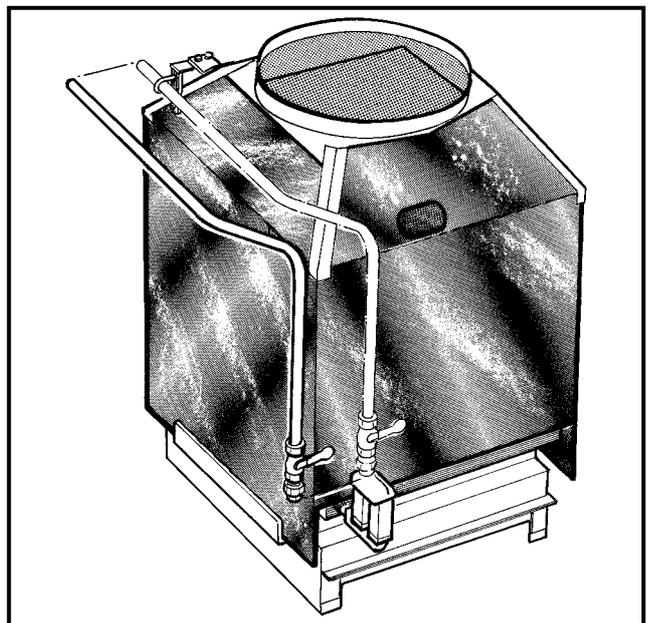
shows the pipe clamp fitted to Purewell 60, 70, 80 and 120 kW boilers.
